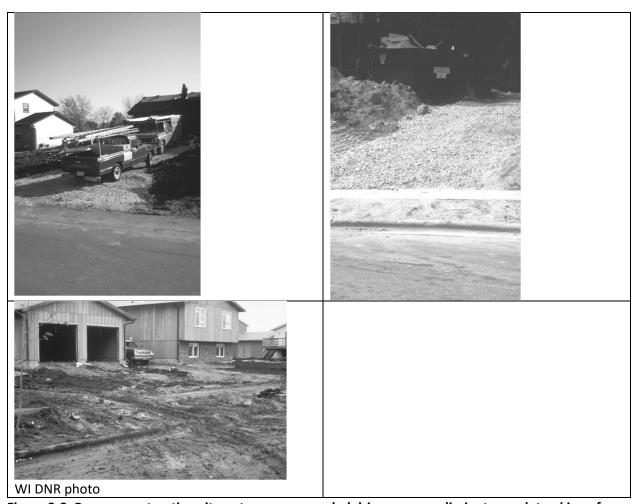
Proper construction site entrance or graveled driveway can eliminate much tracking of sediment onto public roads.
